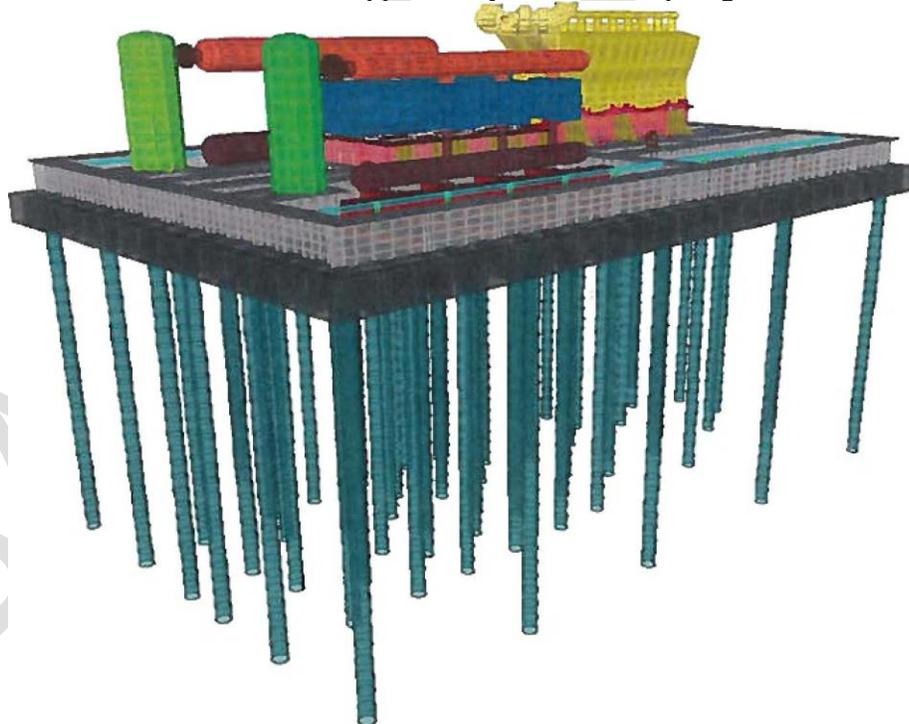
Driver and compressor mounted on a fabricated steel skid that is mounted on a reinforced concrete block foundation.
